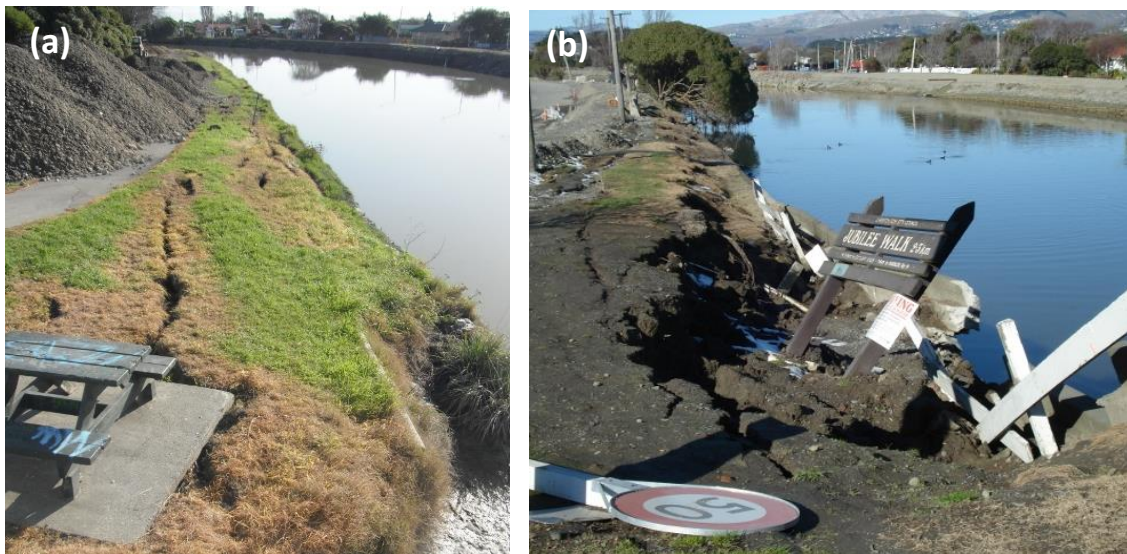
Pages Rd Bridge, (a) west abutment looking north-west, spreading/slumping cracking of river bank, (b) east abutment looking south-east, spreading/slumping cracking of river bank.
